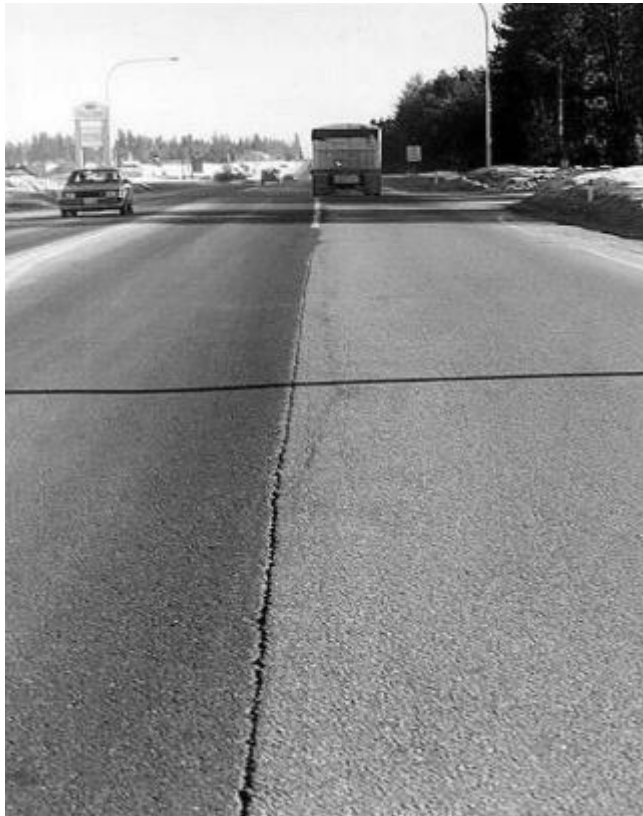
Reflection cracks from old concrete pavement
